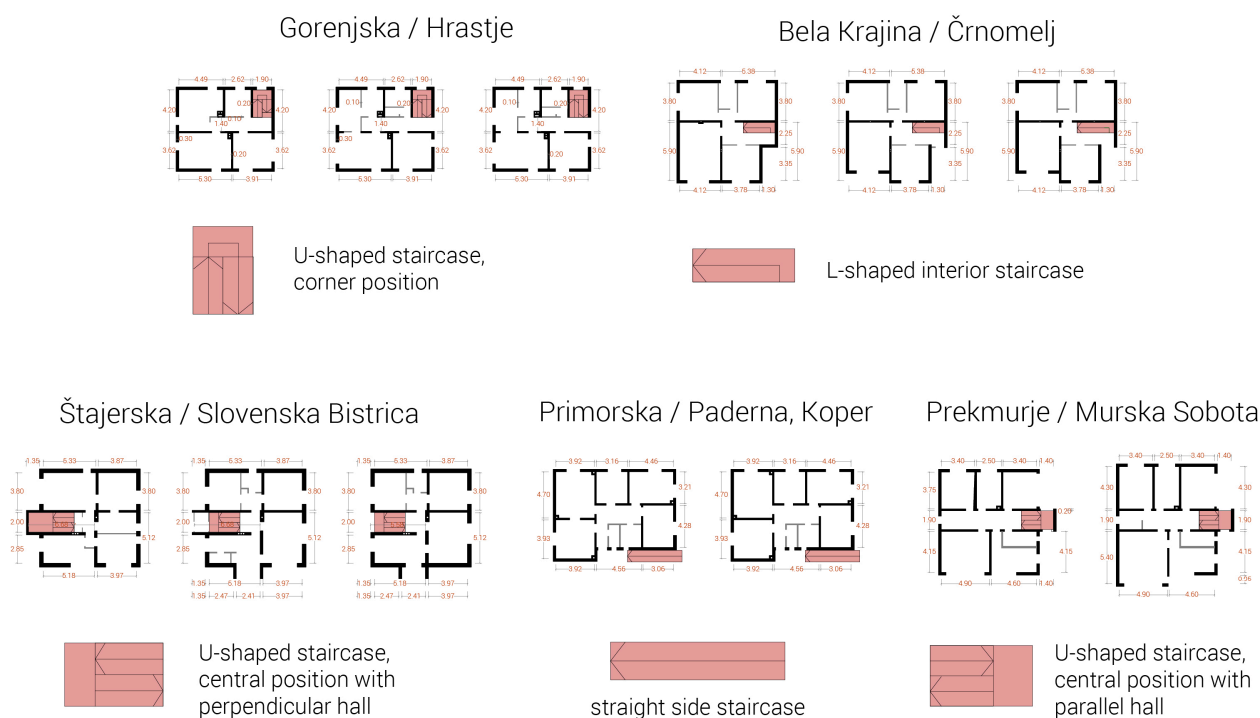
Existing floor plan analysis of five houses in different locations (Gorenjska/Hrastje; Bela Krajina/Črnomelj; Štajerska/Slovenska Bistrica; Primorska/Paderna, Loper; Prekmurje/Murska Sobota) (Ana Belčič, 2022).
